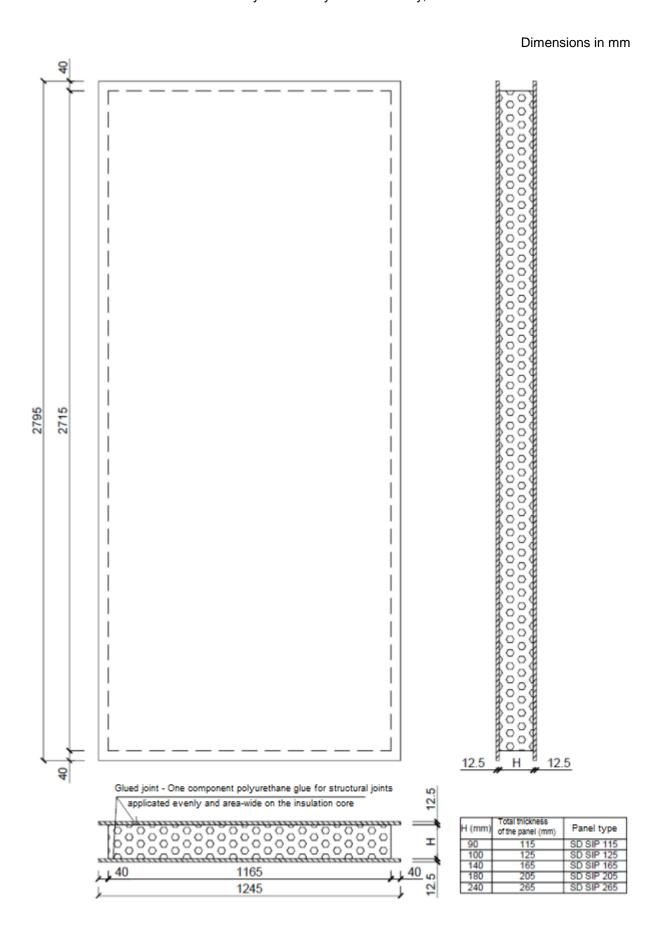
Standard format of the "SE SIP structural insulation panels with skin made of gypsum fibreboard boards for structural use "Vidiwall"
